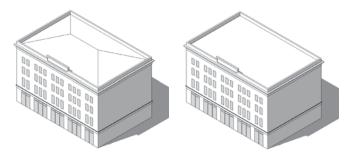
G.2.a.ii: Hipped roof with parapet (left); flat roof with parapet (right)
